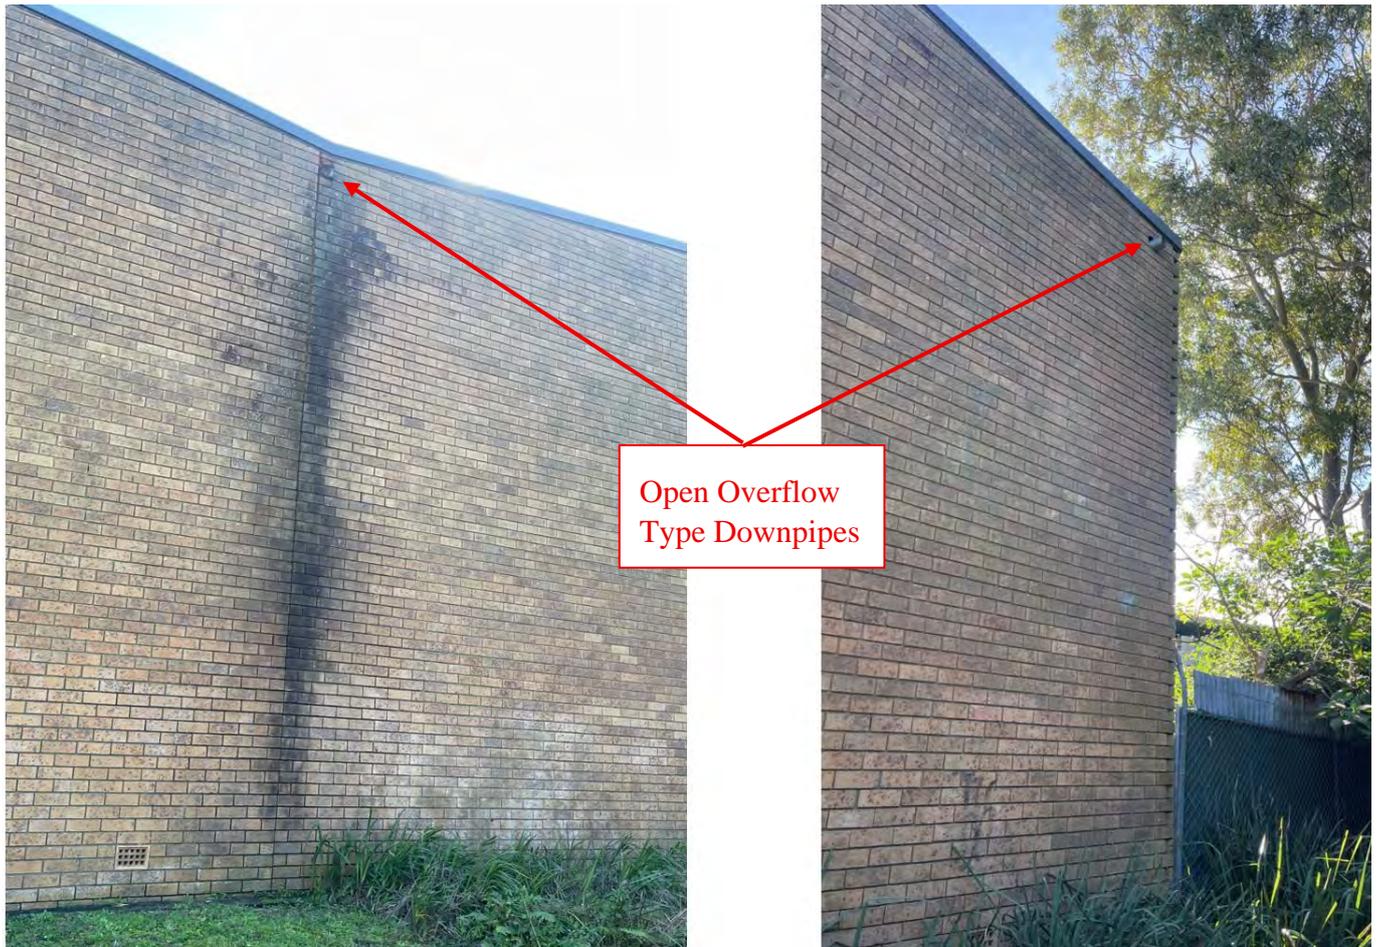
Unmanaged Downpipe from Roof of 25 Pike Street
